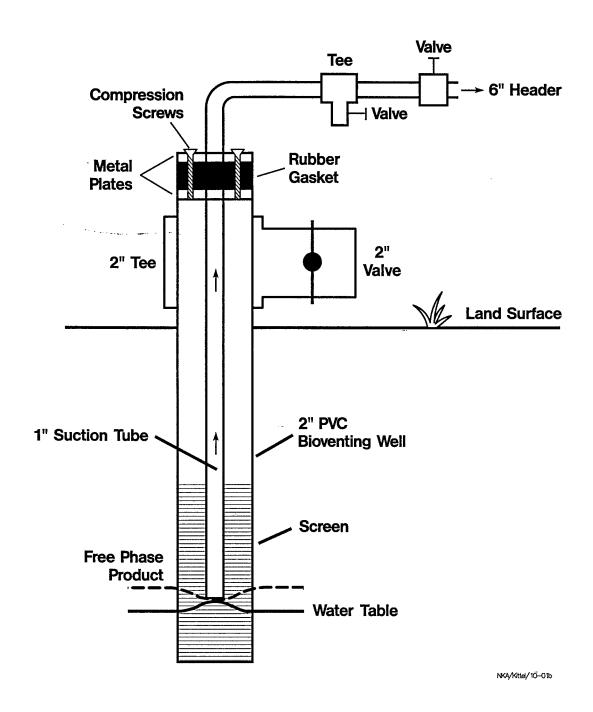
Slurper Tube Placement and Valve Position for the Bioslurper Pump Test
